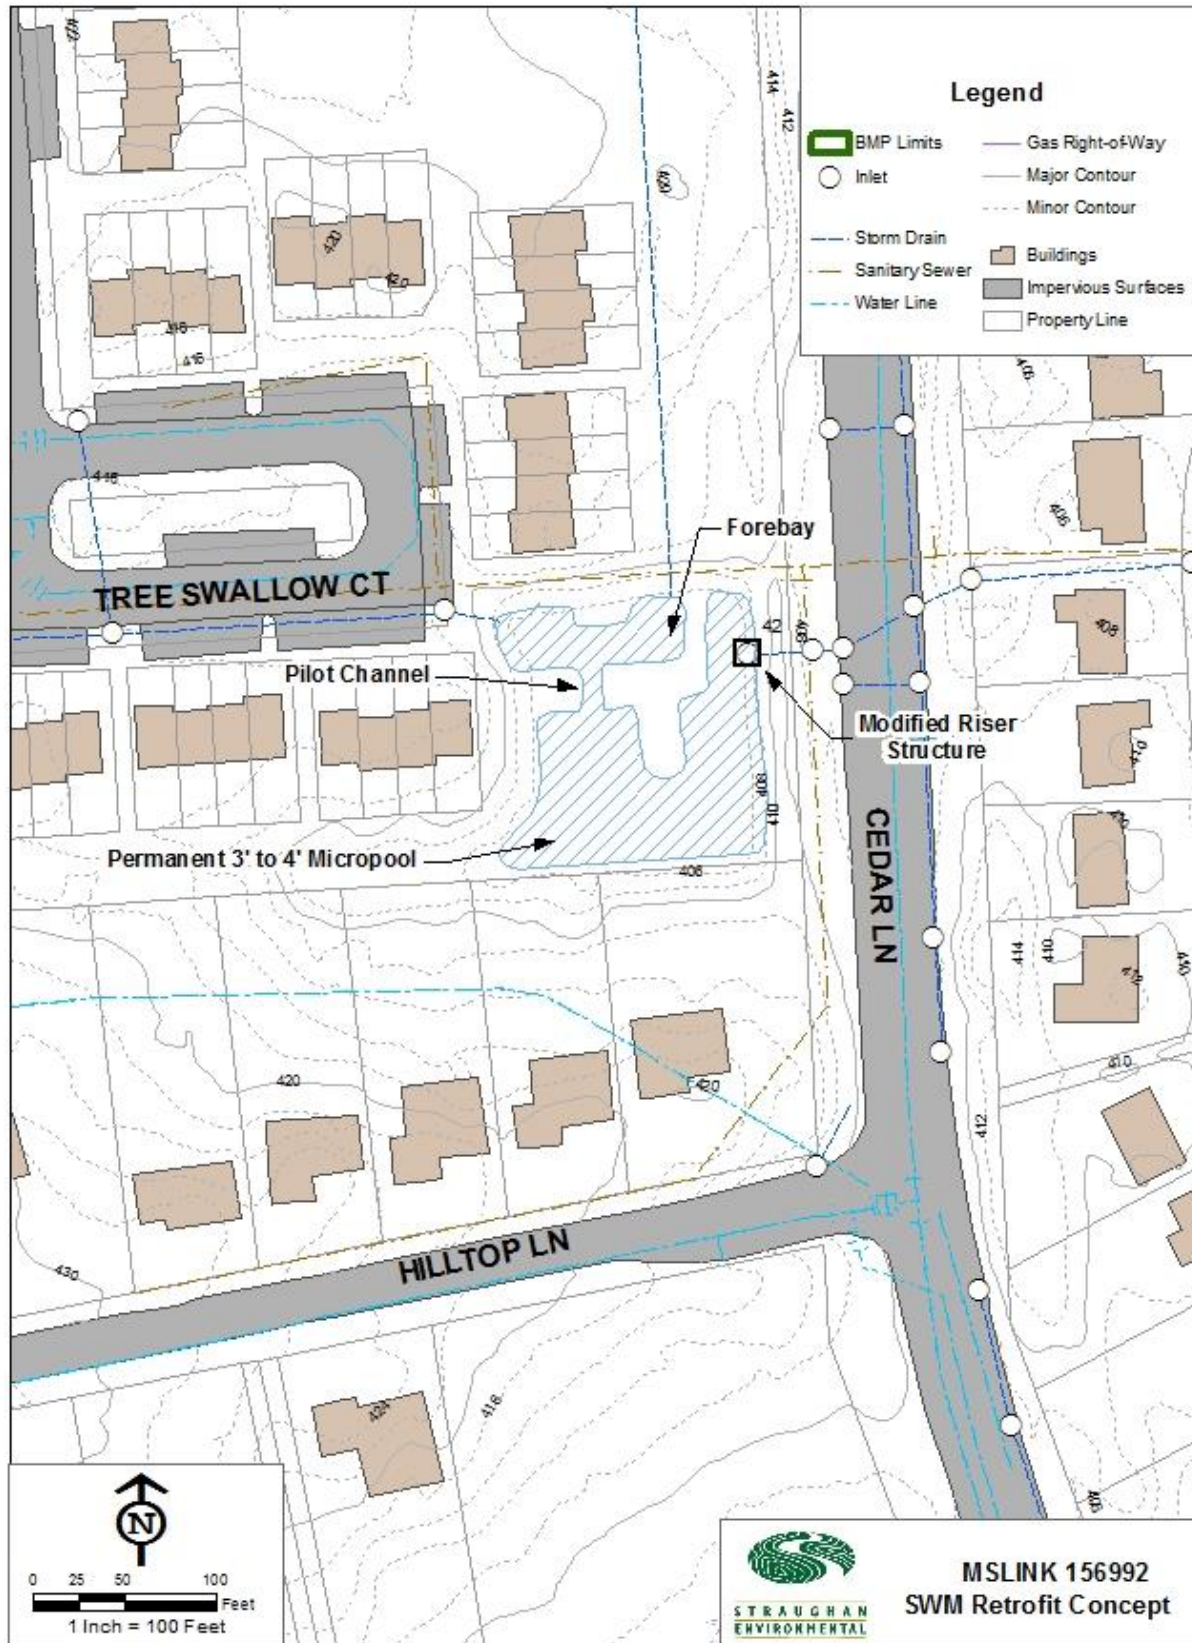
Concept Design Plan View at 6047 Tree Swallow Court, SLP-BC-D780
